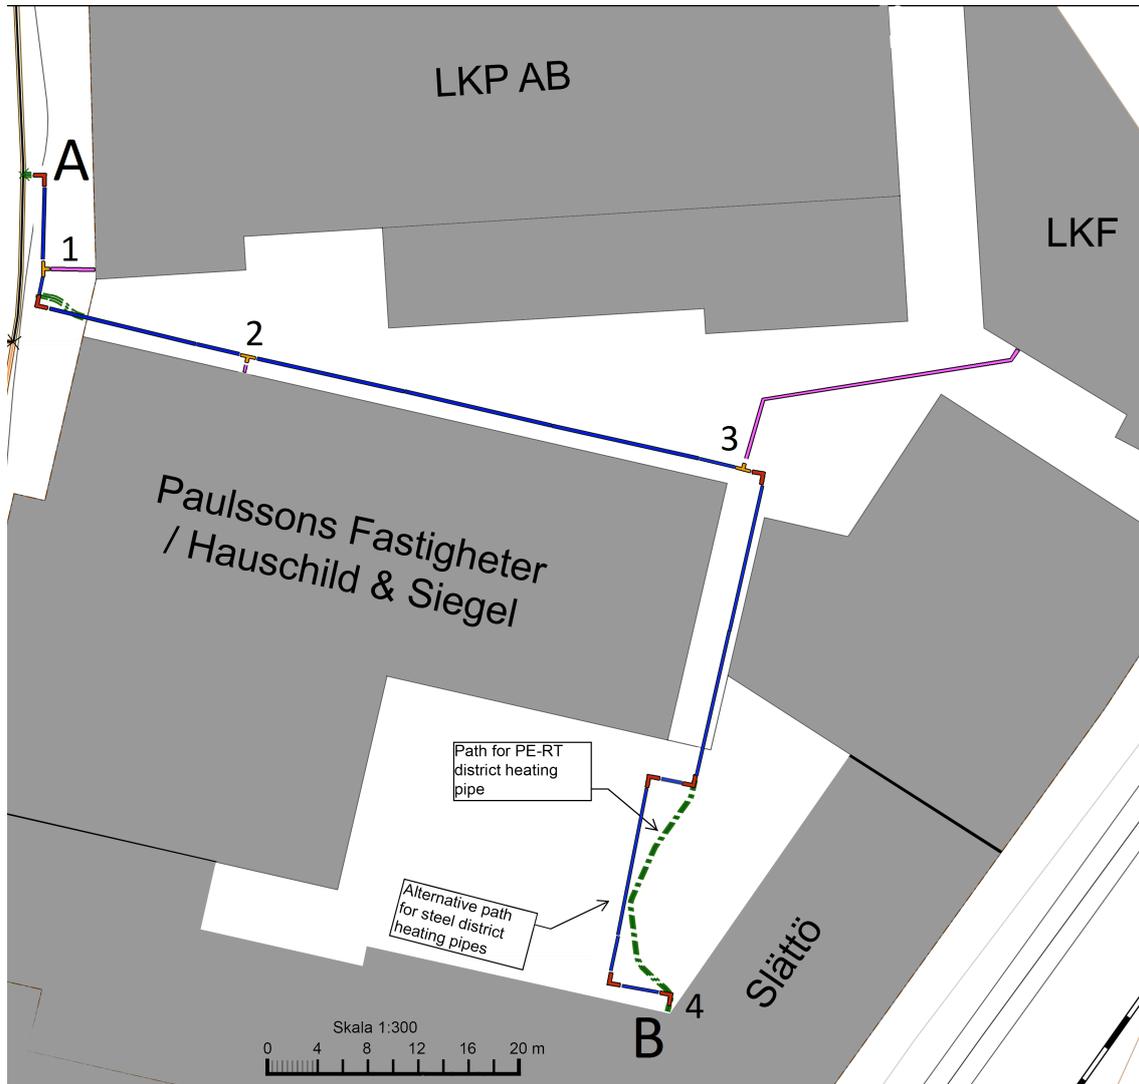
A preliminary layout of the DH branch and its connections at the neighborhood Skymningen at Brunnshög.
